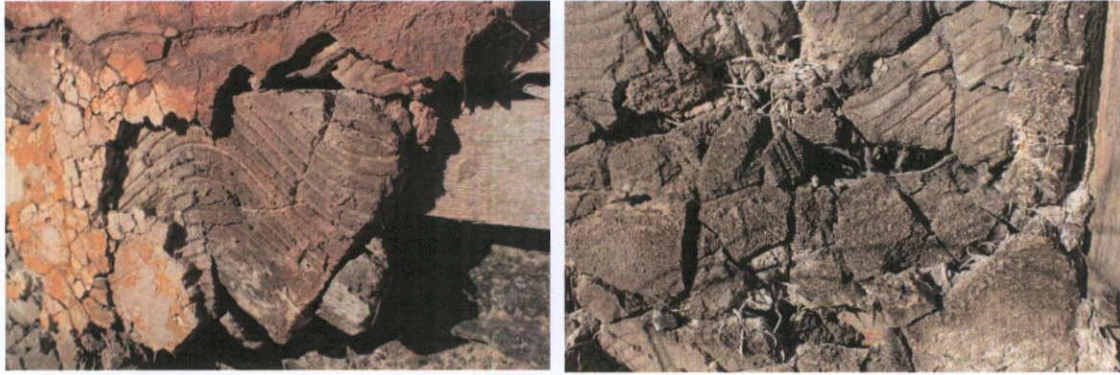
Later keyed plaster with netting support and gypsum top coat laid over the wall.
